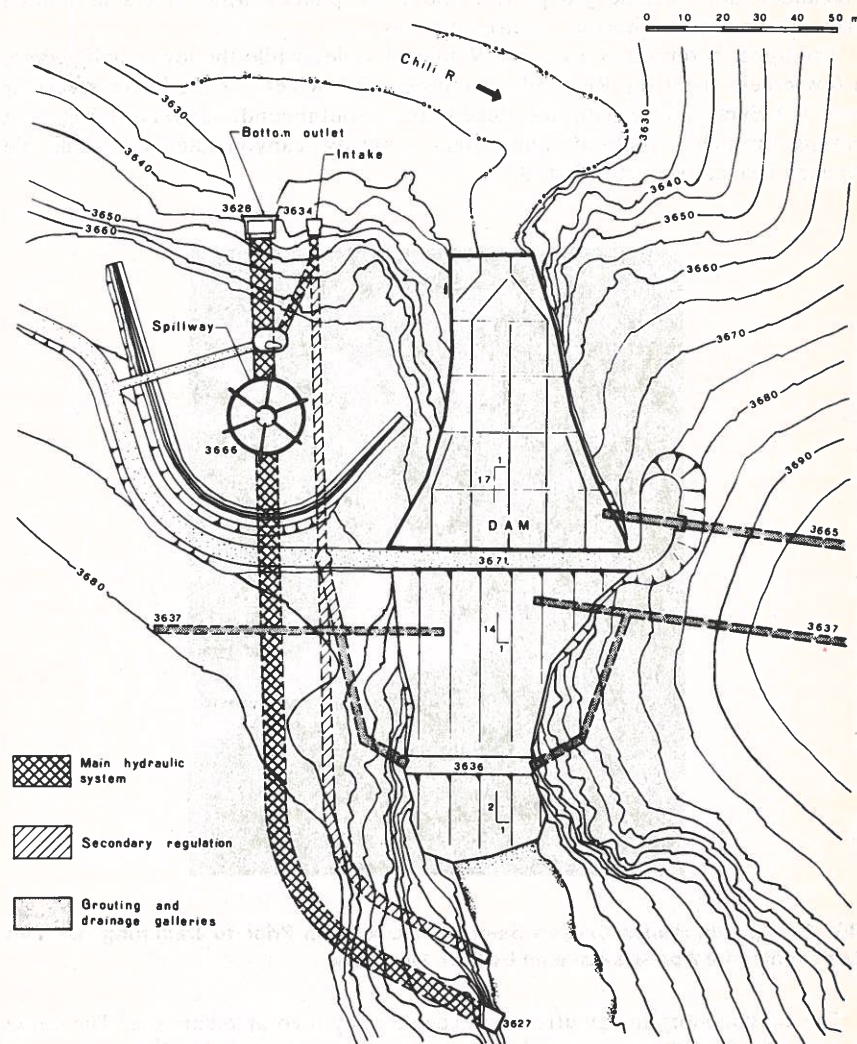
Aguada Blanca Dam—Plan of Rockfill and Ancillary Works
